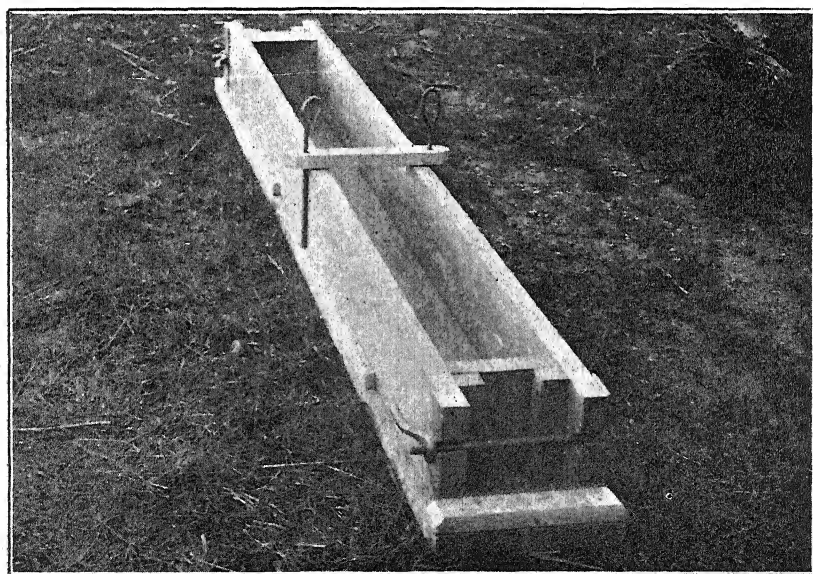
MOULD SIMILAR TO THAT SHOWN IN FIG. 7 (SEE NEXT PAGE), BUT WITH CLEATS AND IRON PINS INSTEAD OF DOWELS.
